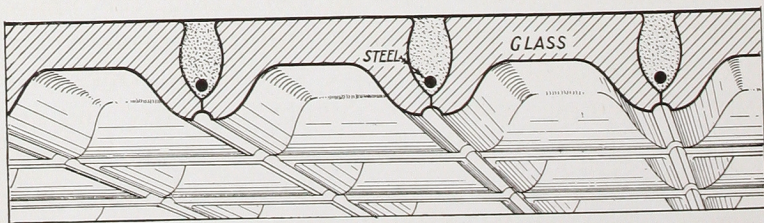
Cross section of Kepler Floor Light, showing reinforced concrete construction and all-glass undersurface. The concave sides of the glasses are painted white to secure total reflection of light rays striking the concrete ribs.
